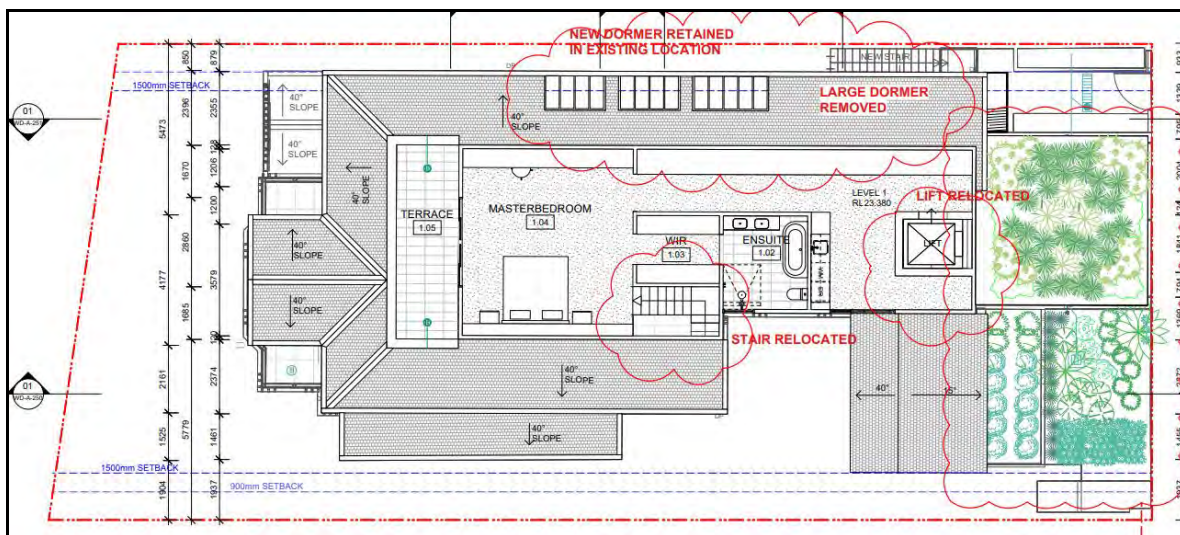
Proposed Level 1 Floor Plan, DA-A-102 Rev L
